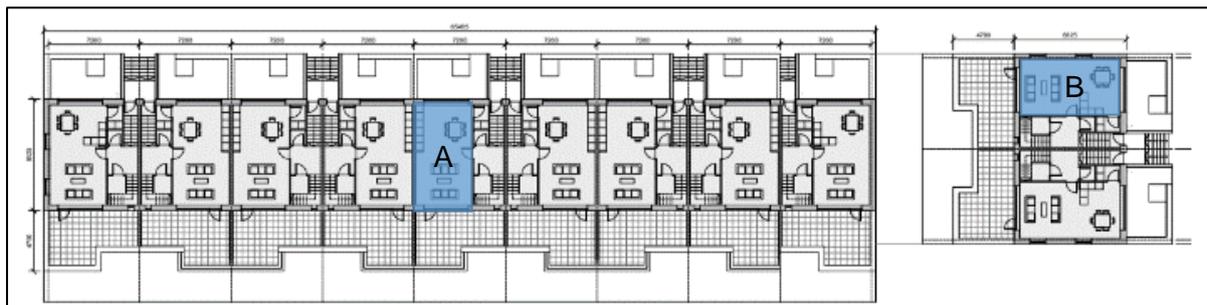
Block D&E – First Floor Assessed Rooms Highlighted in Blue
